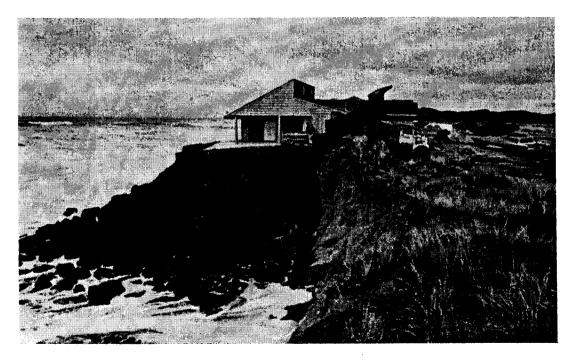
Same house as above after continued storms in January 1973 gouged out sand beyond the terminous of the riprap. Waves have already removed some of the basalt chunks used for riprap. See Photo 84, page 134, showing additional 1973 erosion.
